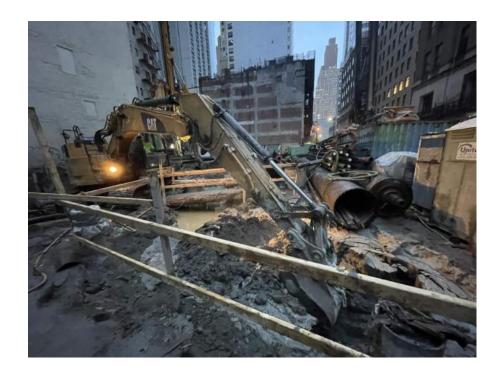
View of Urban loading truck with soil/fill for off-site disposal (facing north).
